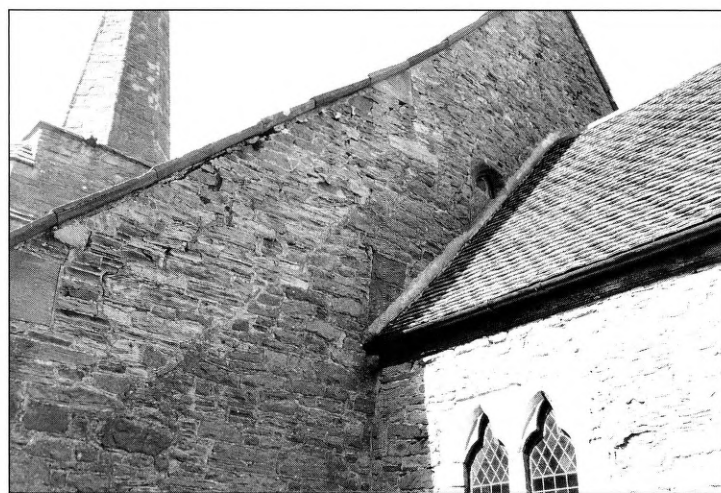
Roof lines on the east wall of the nave showing two or three building phases corresponding with the phasing of the north nave wall and north aisle; south side
